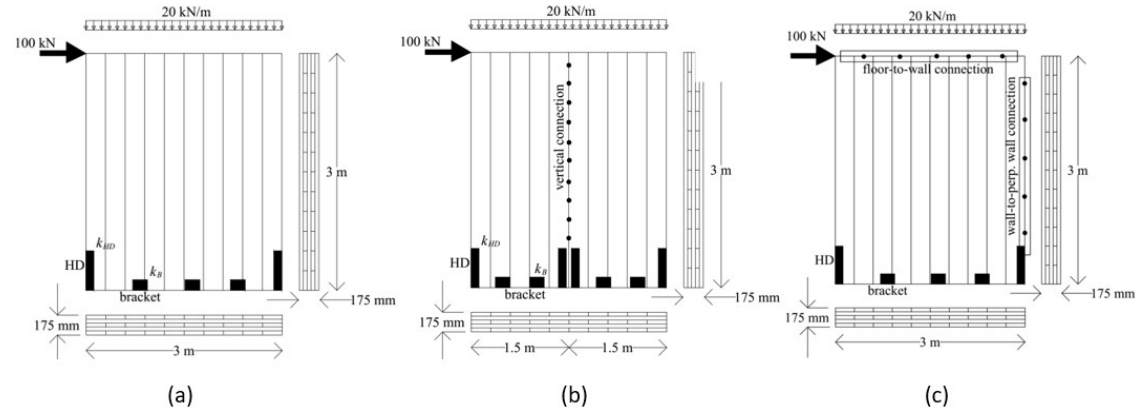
Analytical models of the CLT shear walls with: (a) basic shear wall, (b) coupled shear walls and (c) shear wall connected to a perpendicular wall and floor
